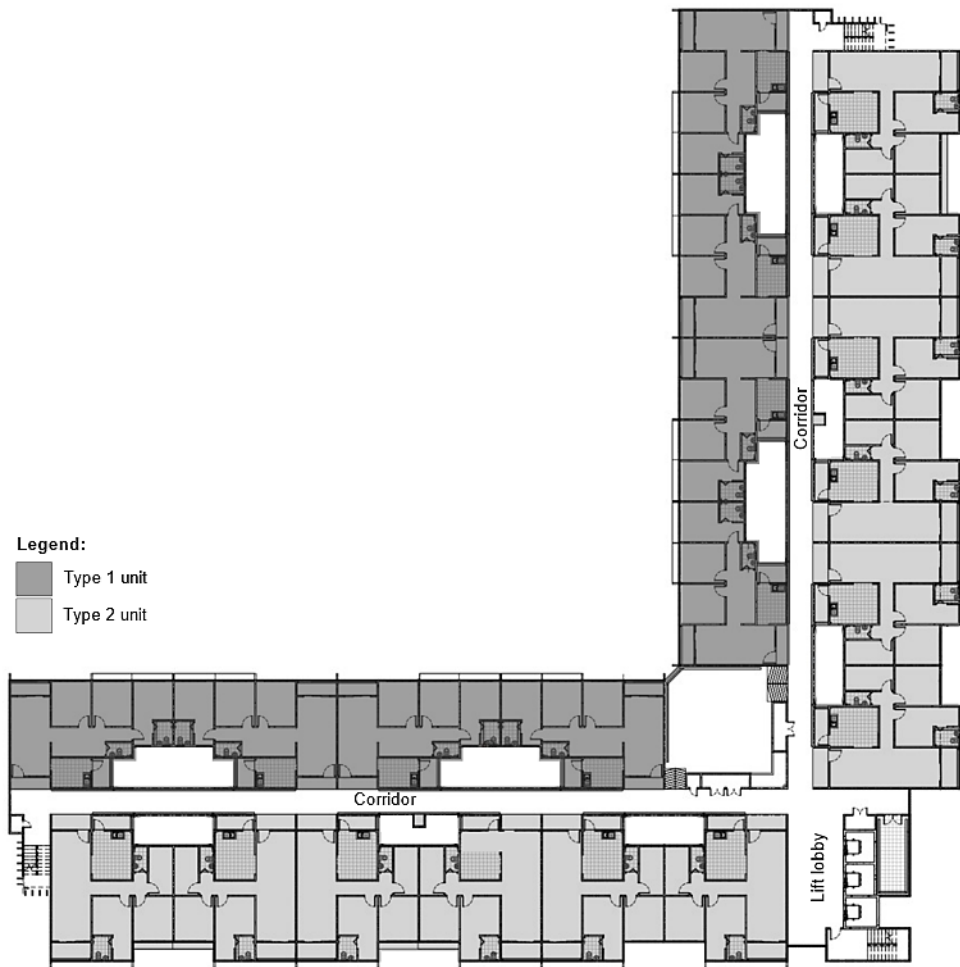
Typical Floor Plan Layout for 18-Storey Apartment
